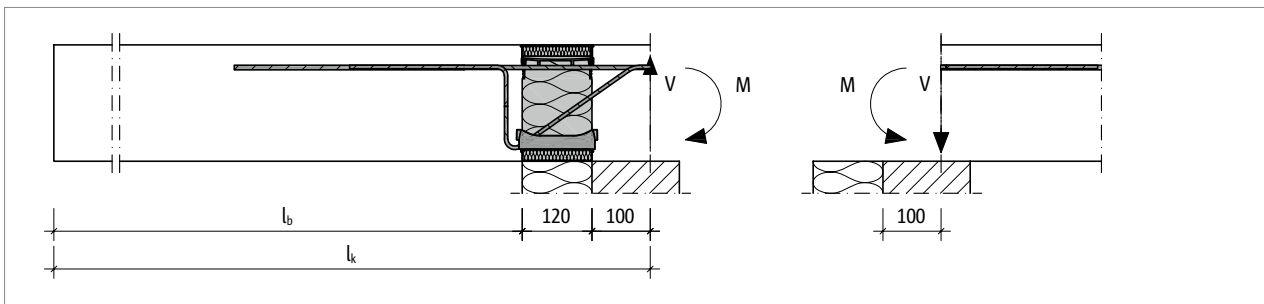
Schöck Isokorb® XT type K: Determined design stress resultants applied to floor slab
